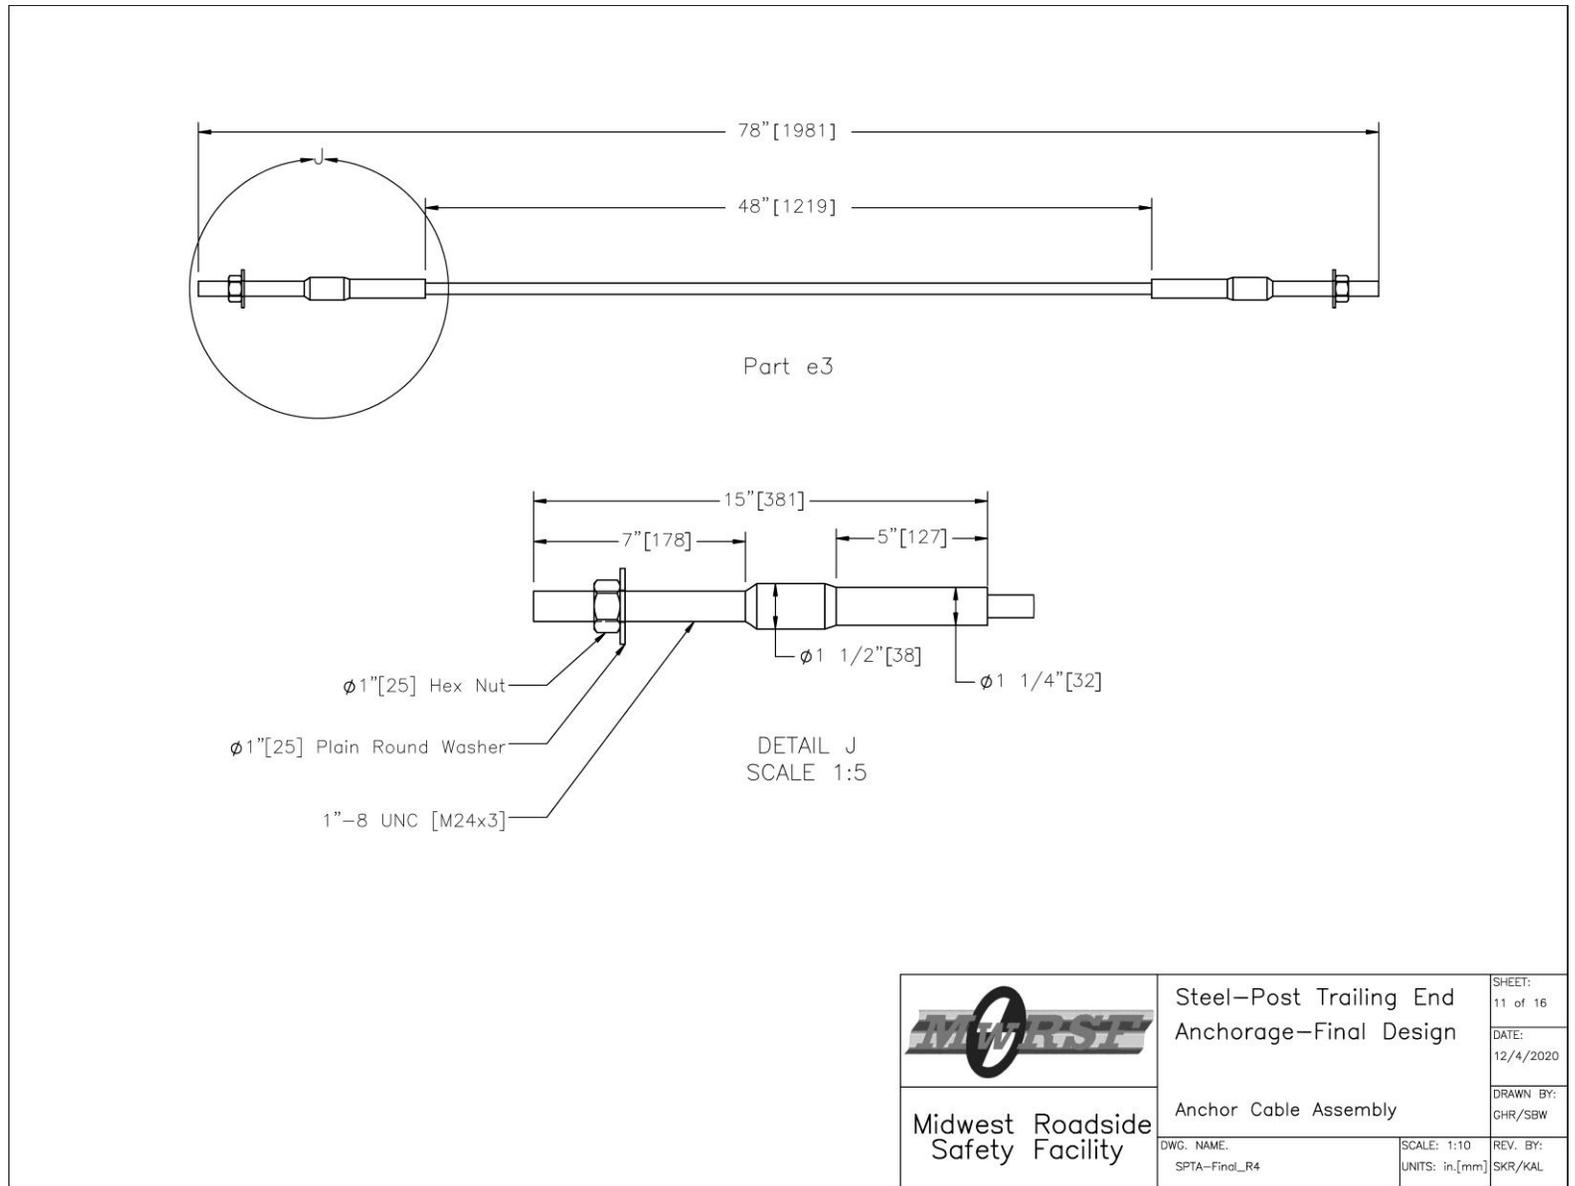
Steel-Post Trailing End Anchorage, Anchor Cable Assembly
